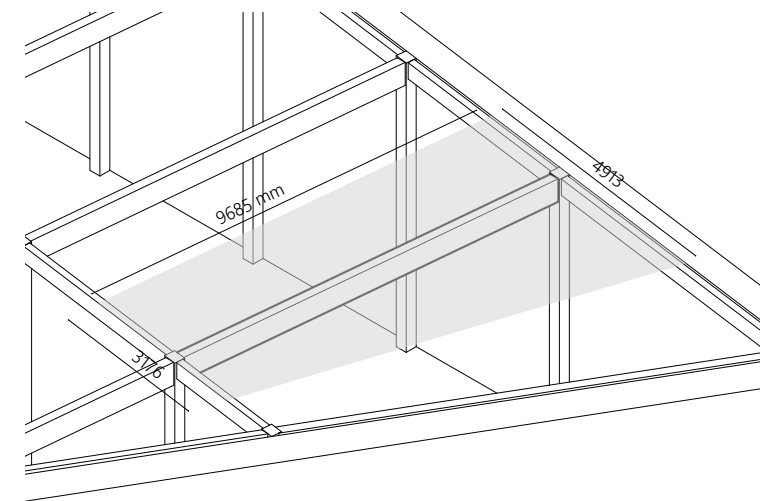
Axonometric drawing with load on the roof beam (Own work, 2024)
